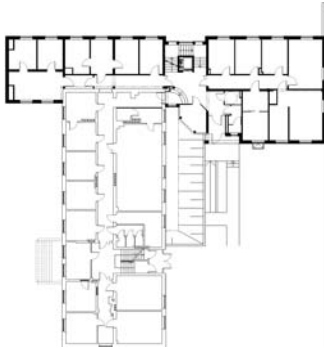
The plan of the ground floor of the Institute of Animal Reproduction and Food Studies PAN in Olsztyn. Drawing: B. DEJA
